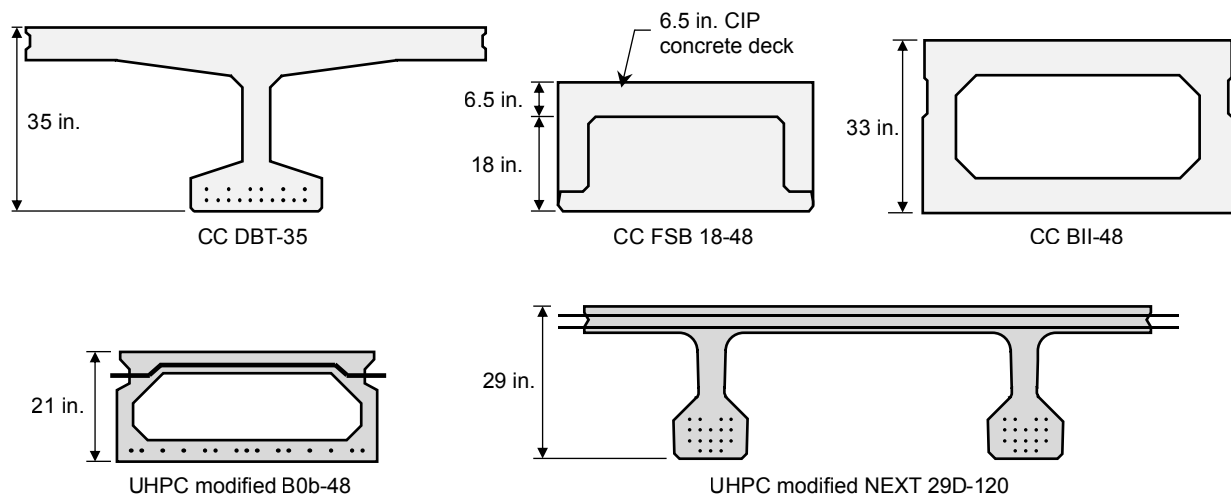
Design alternatives for 60 ft span length for case study 5. Note: CC = conventional concrete; CIP = cast-in-place; DBT = deck bulb tee; FSB = Florida slab beams; NEXT = northeast extreme tee; UHPC = ultra-high-performance concrete. 1 in. = 25.4 mm.
